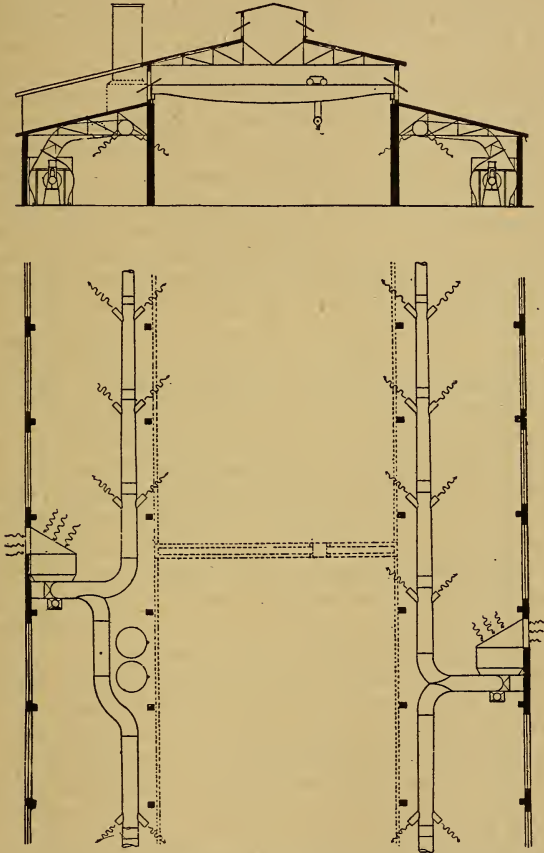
Typical Arrangement of Heating and Ventilating System for Foundry with Unobstructed Craneway.
